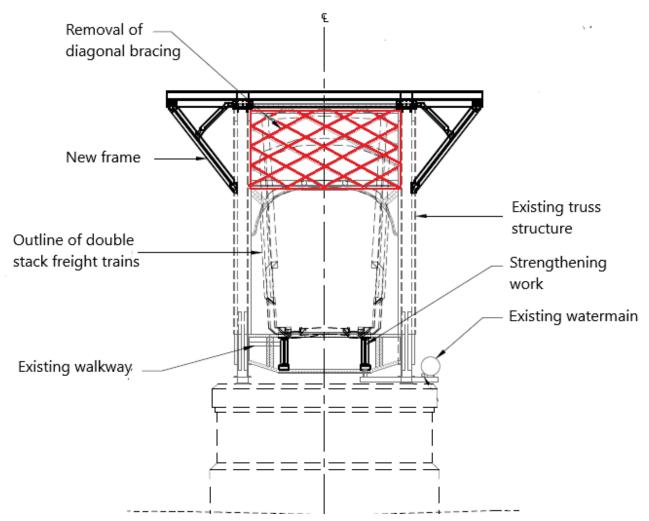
CROSS-SECTION OF THE PROPOSED WORKS ON THE BRIDGE STRUCTURE FOR THE BRIDGE (RED—REMOVED SECTIONS, BLACK—NEW SECTIONS AND GREY—RETAINED SECTION)
